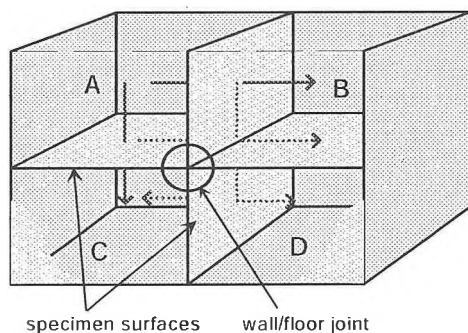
Special facility for the measurements. Party wall assembly and floor divide the space into 4 rooms. Structural transmission via facility surfaces is suppressed.
